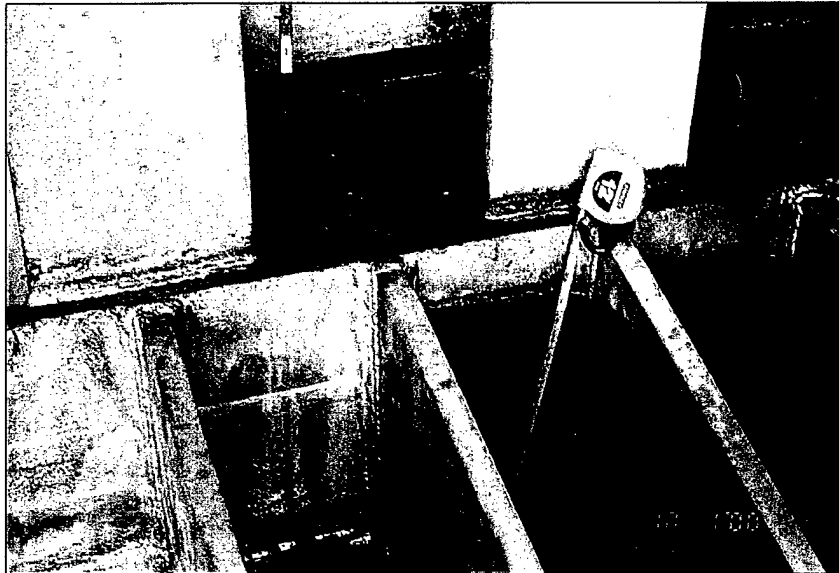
Standing water between stiffeners at ends of bottom horizontal girder, typical.
